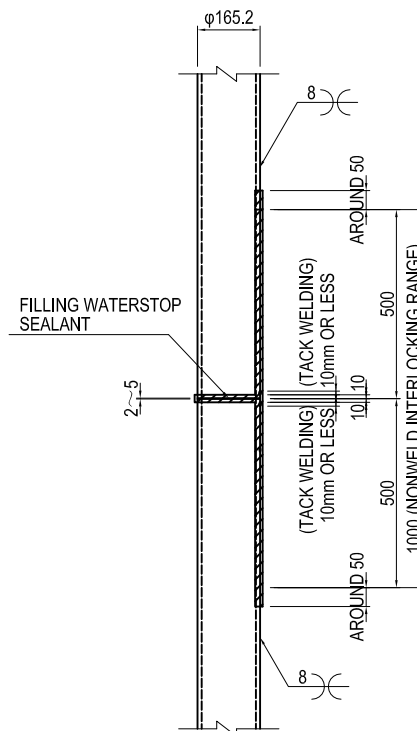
DETAIL OF IN-SITU ATTACHED INTERLOCKING S=1:10
